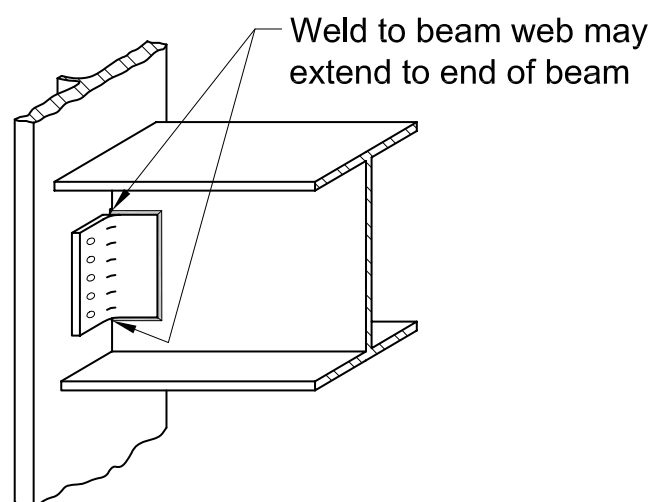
Fillet weld details on framing angles.
